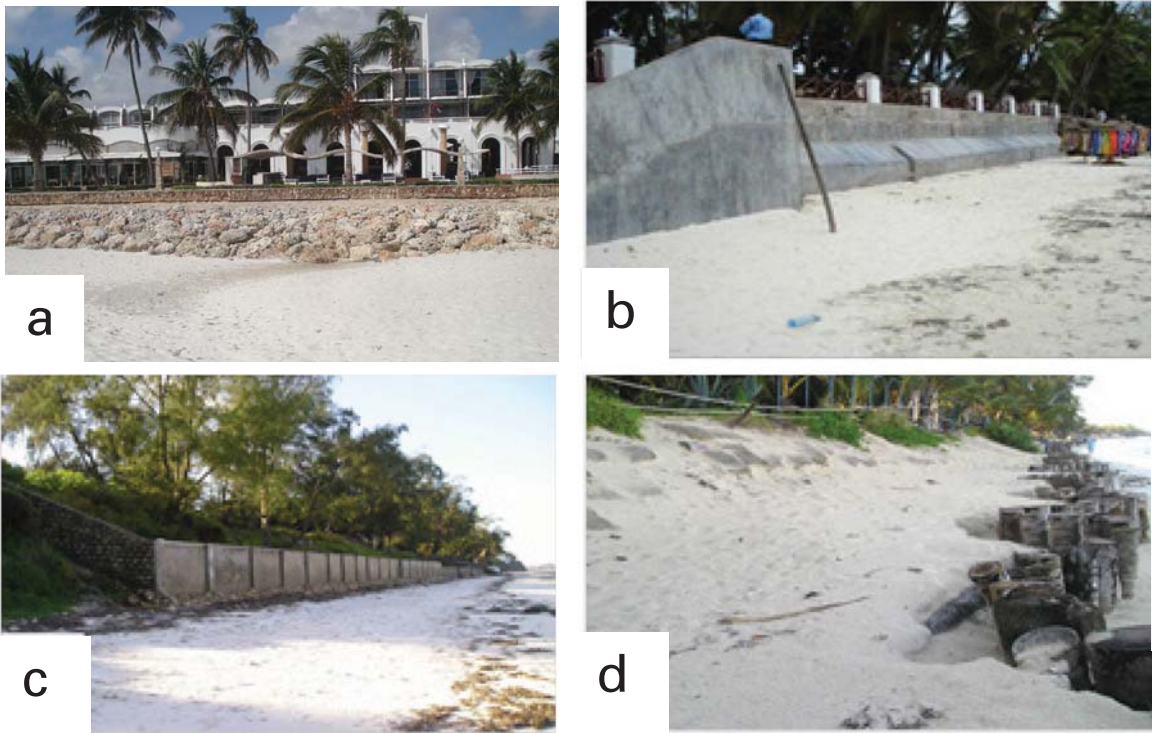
Coastal protection measures on the Kunduchi and Bamburi shores: (a) a vertical masonry seawall caps a rock-block revetment at Kunduchi Beach Hotel; (b) bulkhead wall protection at SeverinSea Lodge, Bamburi; (c) vertical masonry seawall on the Nyali shore, subject to frequent collapse and repair; (d) palisade of palm tree trunks installed for protection at Whitesands Hotel, Bamburi. Photos: (a) Y.W. Shaghude; (b,c,d) J.W. Mburu.
